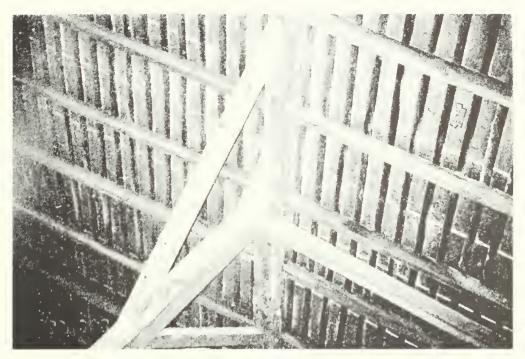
Rotted connection of angled purlin post (diagonal brace) to roof purlin (forebay side of interior).
